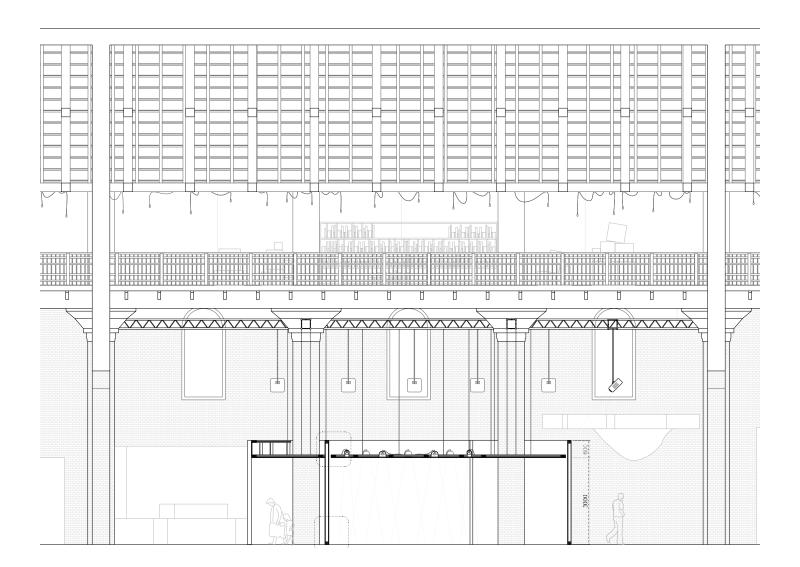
[Above] - Author, *Plan Detail - Outer Shell*, 2021. Fig. 24 - [Right] - Author, *Plan Detail - Interior Shell*, 2021.
